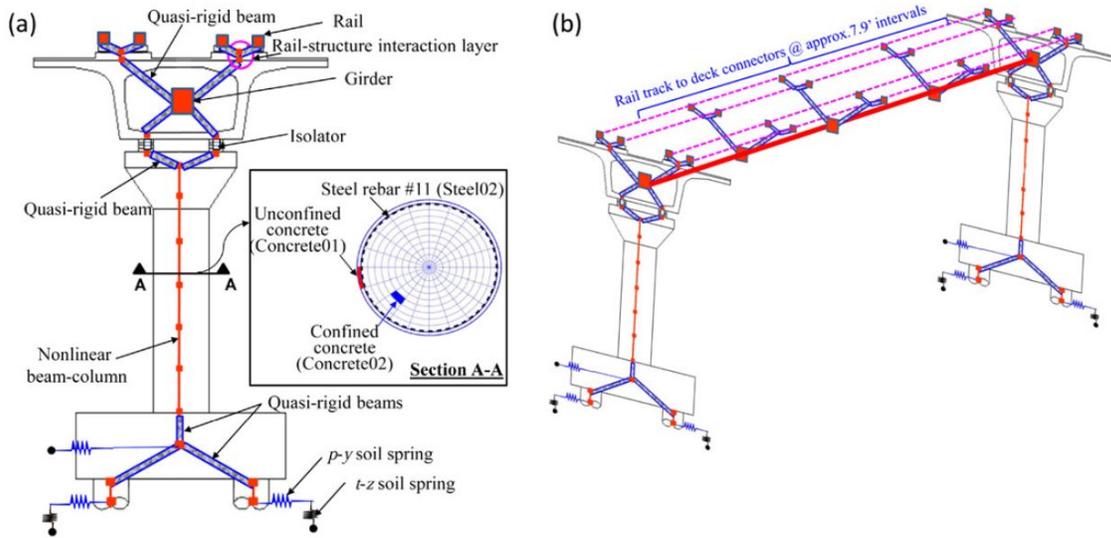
Example FE model scheme illustrating connections between each bridge element (Li and Conte 2016).
